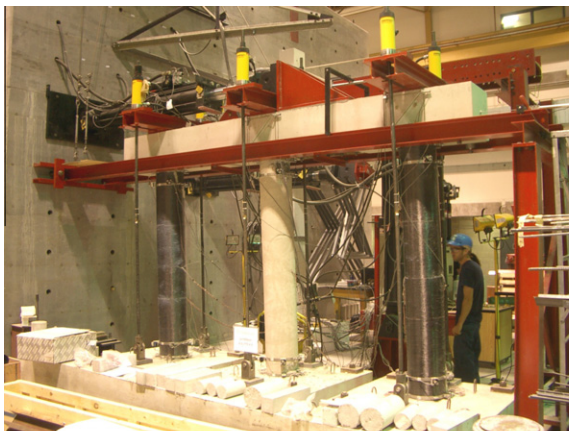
Bridge pier under cyclic loading: Geometrical properties.
